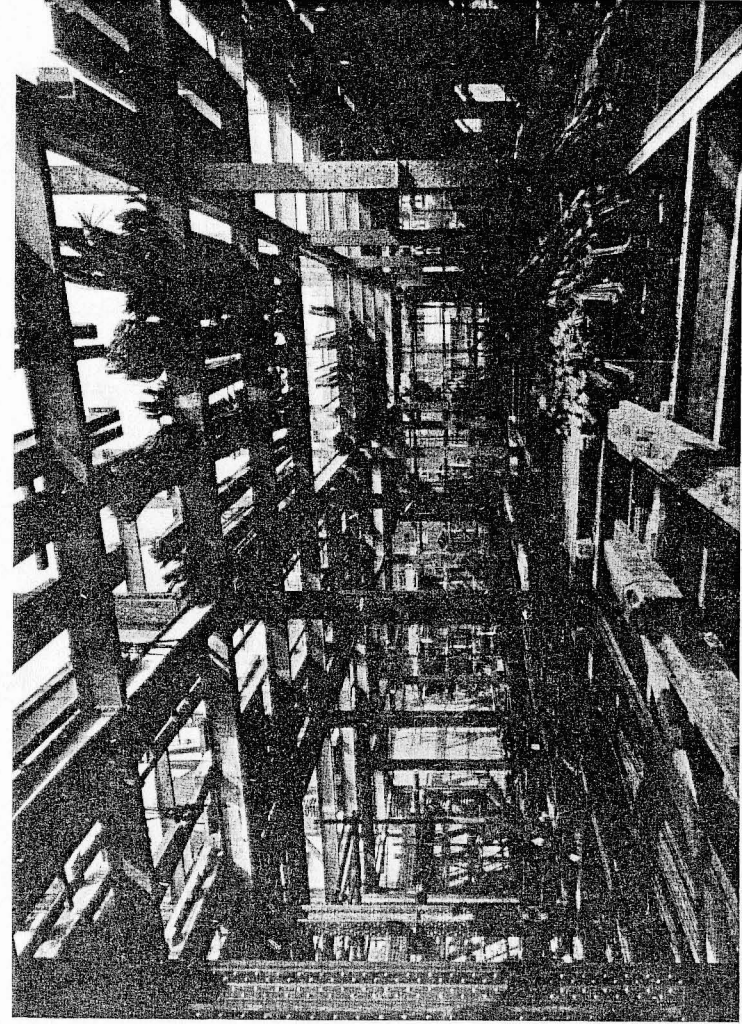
The constructional steelwork of Selfridges (from *Concrete and Constructional Engineering*, March 1909).
